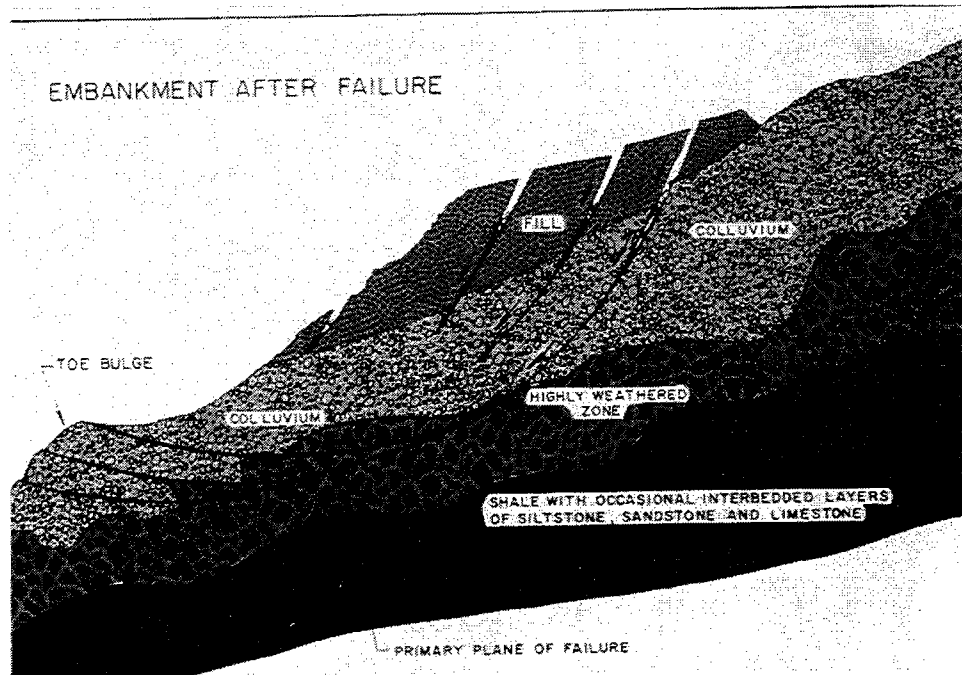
Schematic Drawing Showing Failure of Embankment Due to Unstable Foundation Material.
